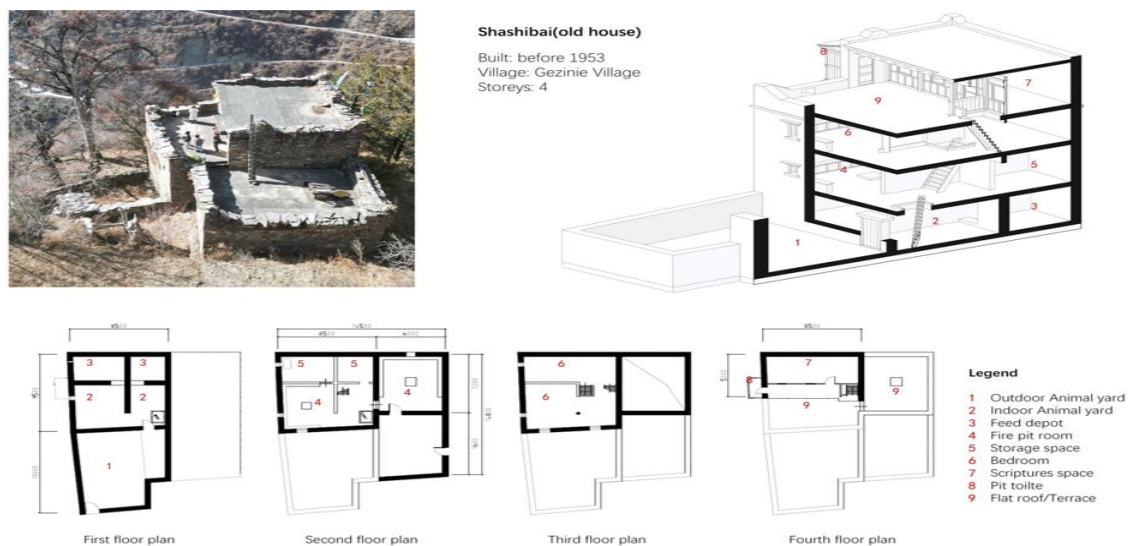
Current Photos, Cross-Section Perspective and Floor Plan of the Old Sha Shi Bai Family House (GL01)
